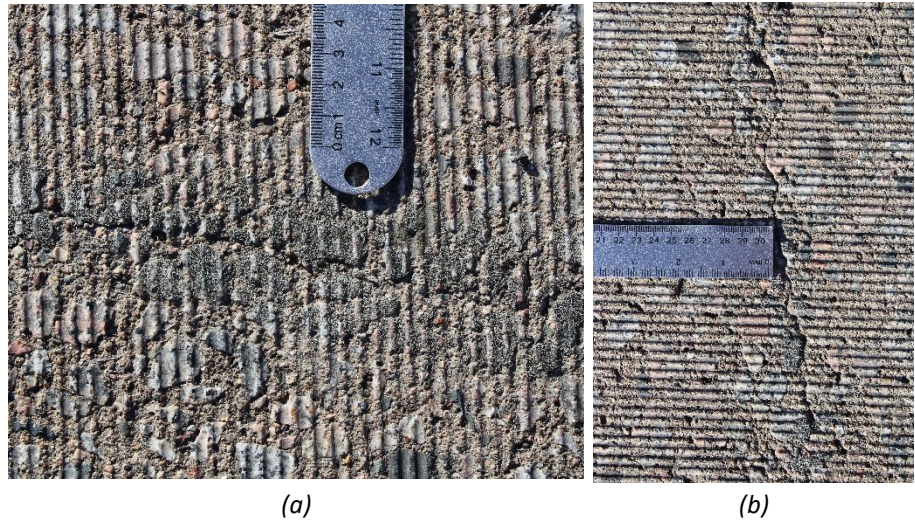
Close-up view of cracks in the bridge decks: (a) steel-reinforced bridge deck (27W36) and (b) GFRP-reinforced bridge deck (27W37)
